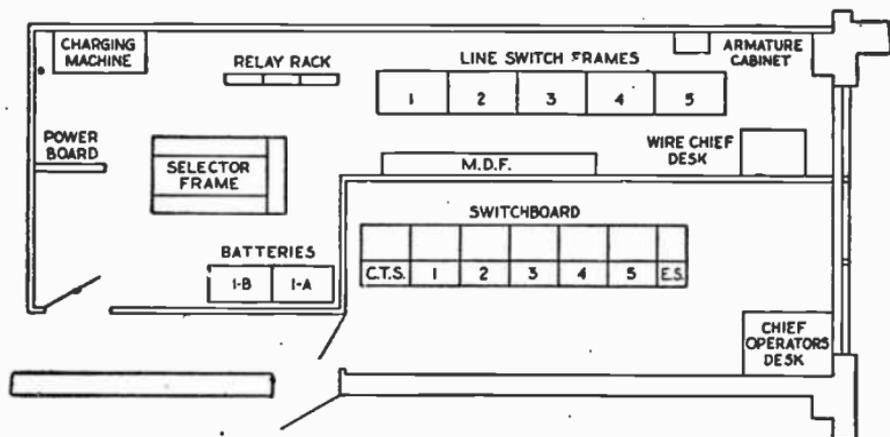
,686.—Typical floor plan of three digit step-by-step Private Branch Exchange.
